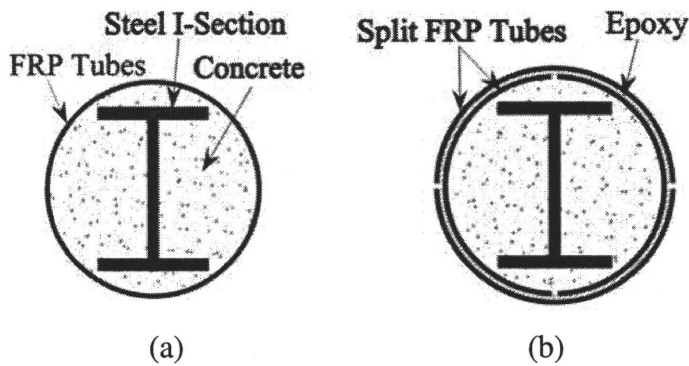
Proposed composite system (a) new construction (b) retrofit of existing steel columns
